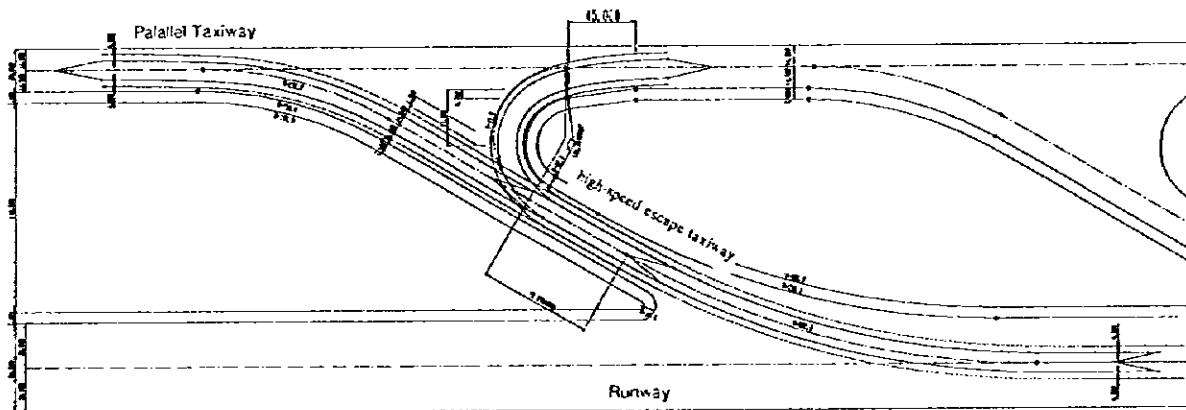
Fillet Form in the Crossing Part (1)
